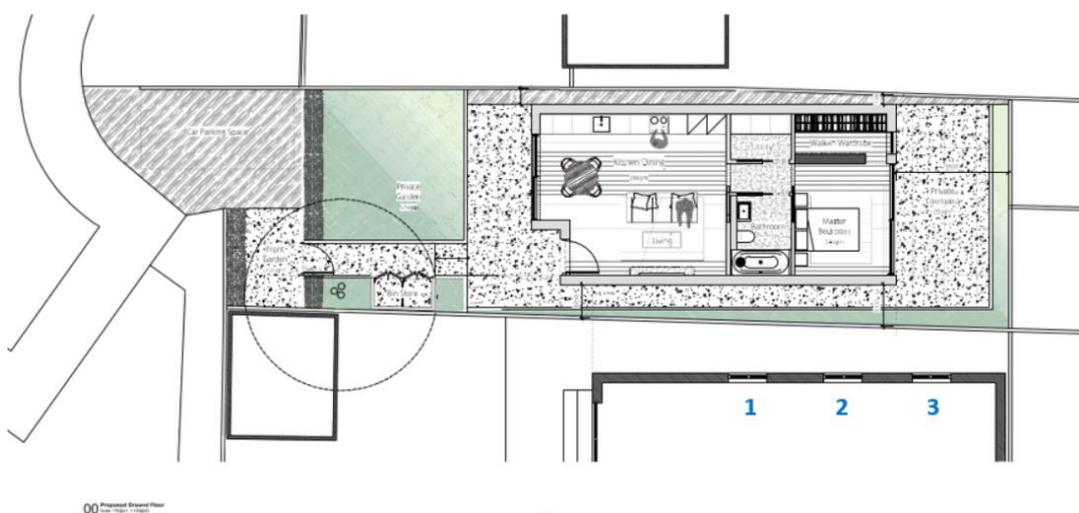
Extract of proposed ground floor plan with windows of No.69 identified.
